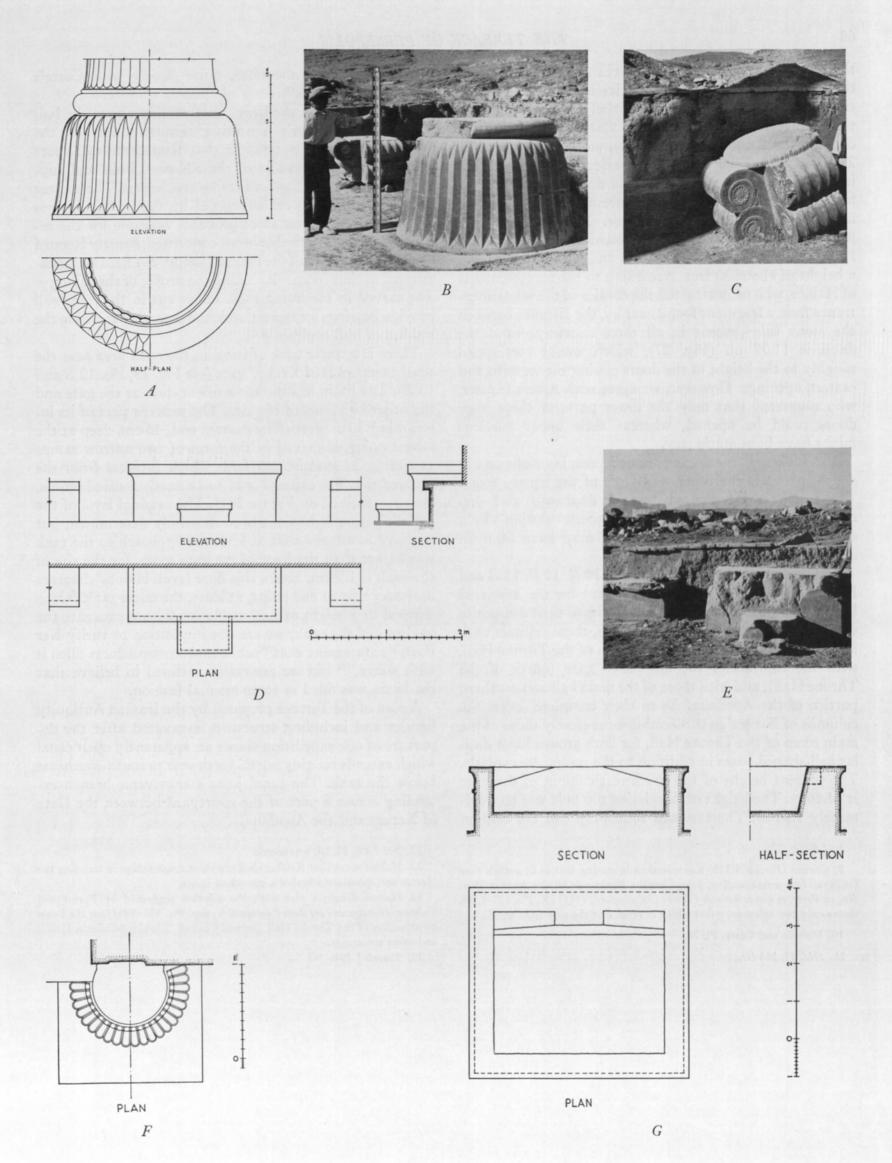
Gate of Xerxes. A. Plan and Elevation of Northeast Column Base. Scale, 1:40. B. Northeast Column Base. C. Unit of Composite Capital Lying Inverted in Northeast Corner. D. Reconstructed Stone Altar(?) Flanked by Stone Benches. Scale, 1:50. E. Same Altar(?) at Center of North Wall. F. Decorative Stone Ring of West Socket Stone at Southern Doorway. Scale, 1:40. G. Tank near Gate. Scale, 1:100
